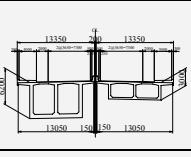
Bridge Profile and Section for Alternative Bridge Types in Bridge Location A
